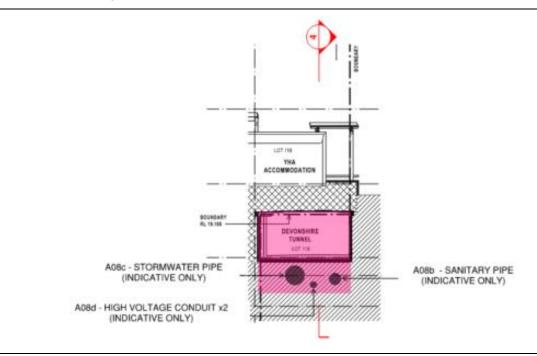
Cross-Section Elevation View of Devonshire Street Tunnel' (BVN Dwg. AR-23D-GXX-04[2])
